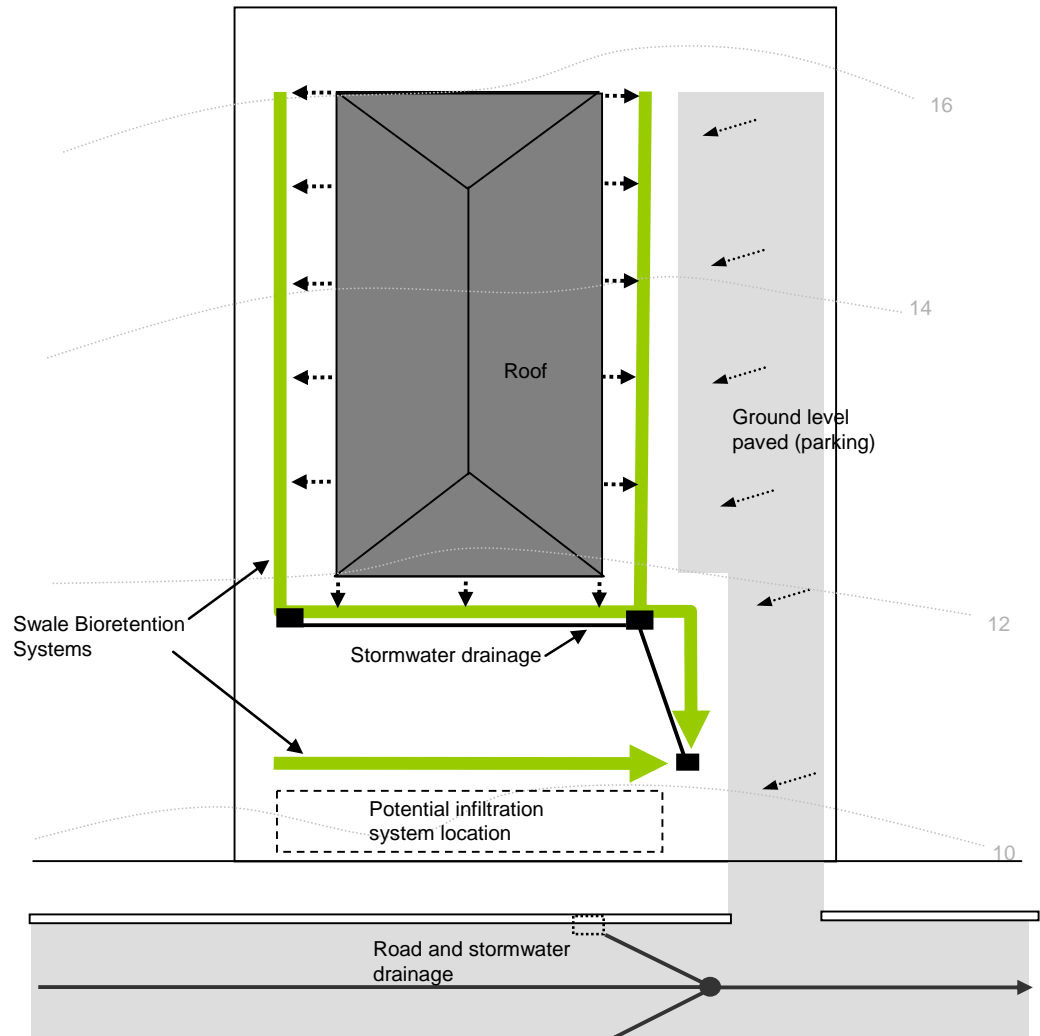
Site Layout (see Figure 7.10 for Drainage Detail)
